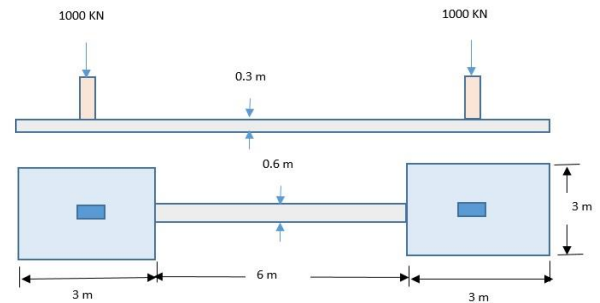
Geometrical and loading details of Slab – Beam Foundation
